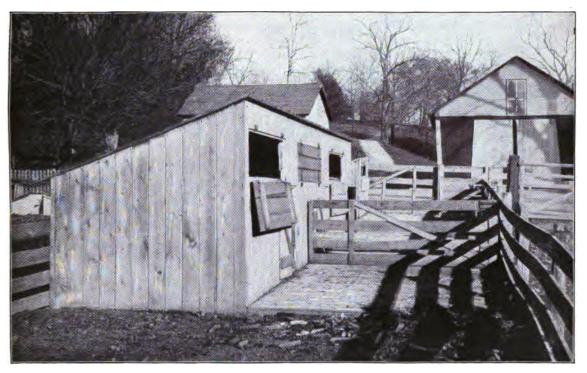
HOGHOUSE AND FEEDING FLOOR.
